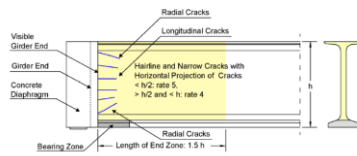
Horizontal or radial end zone cracks in NU girder webs with ends encased in concrete diaphragms
